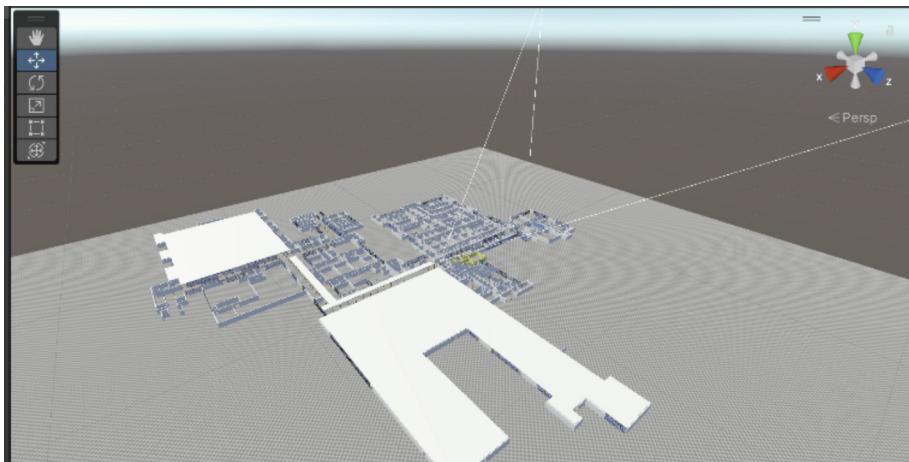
Initial modeling: 2D model of the campus building exported to sketch up and extruded to create a 3D model (2nd floor plan).
